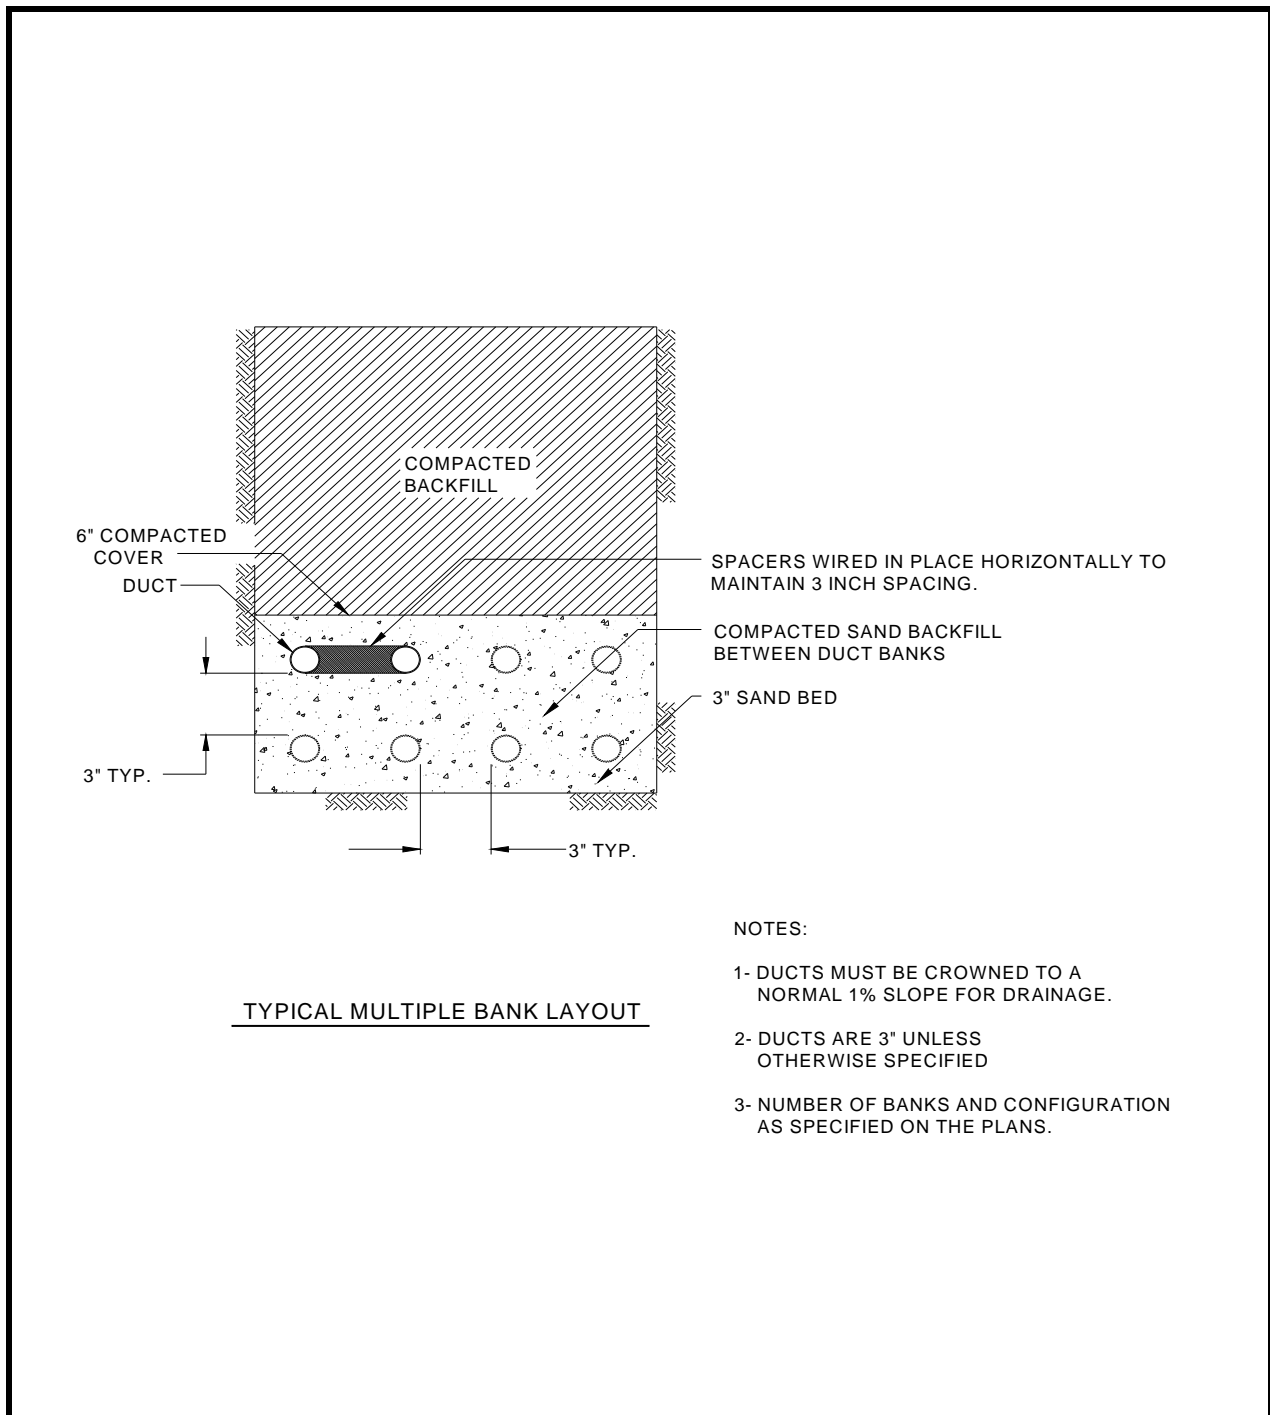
Standard Details for Underground Cable Installation – Typical Multiple Bank Layout.
